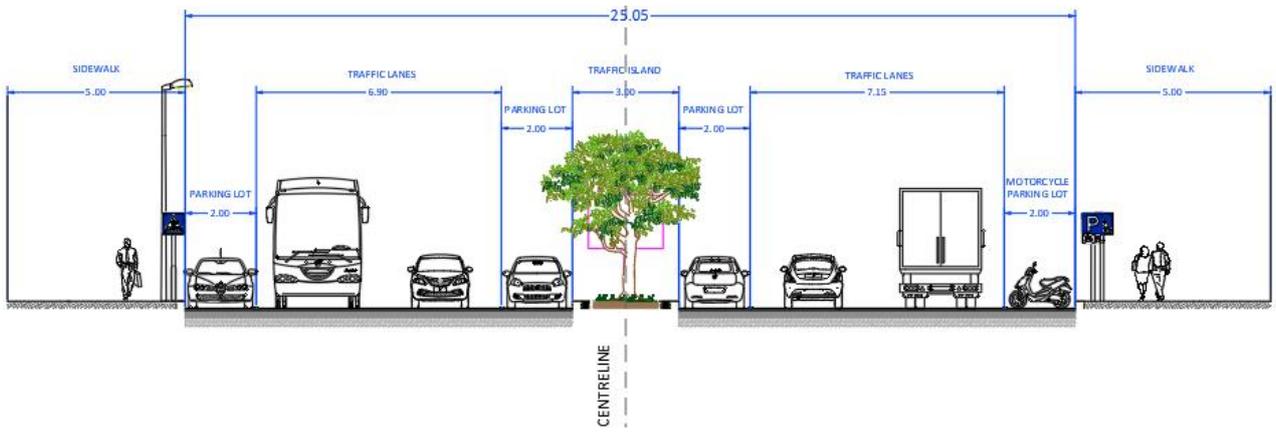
Cross section, section Q-Q'; road segment of Viale Papa Giovanni XXIII.
